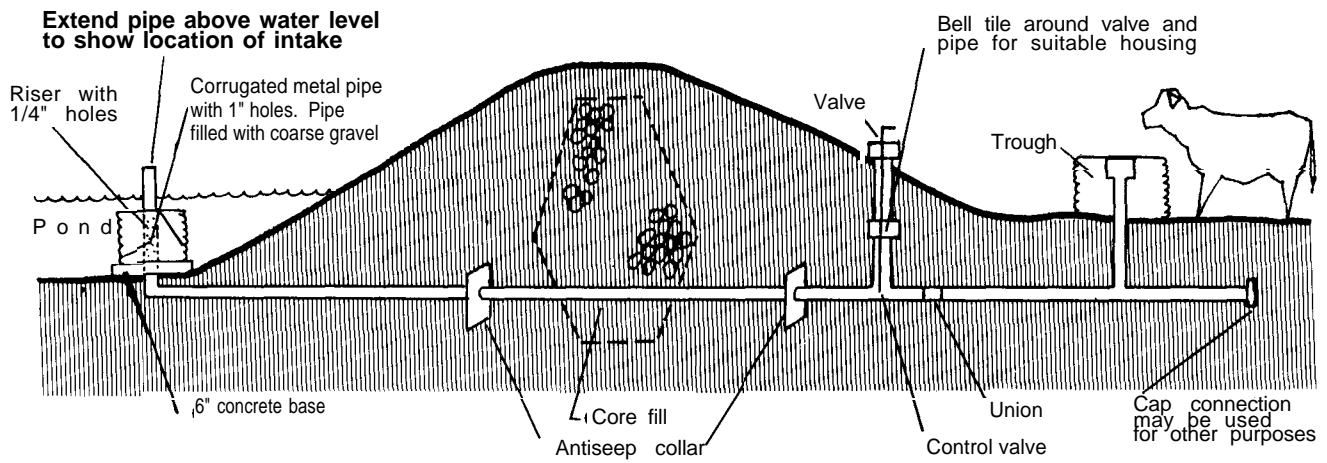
Water is piped through the dam's drainpipe to a stockwater trough.
